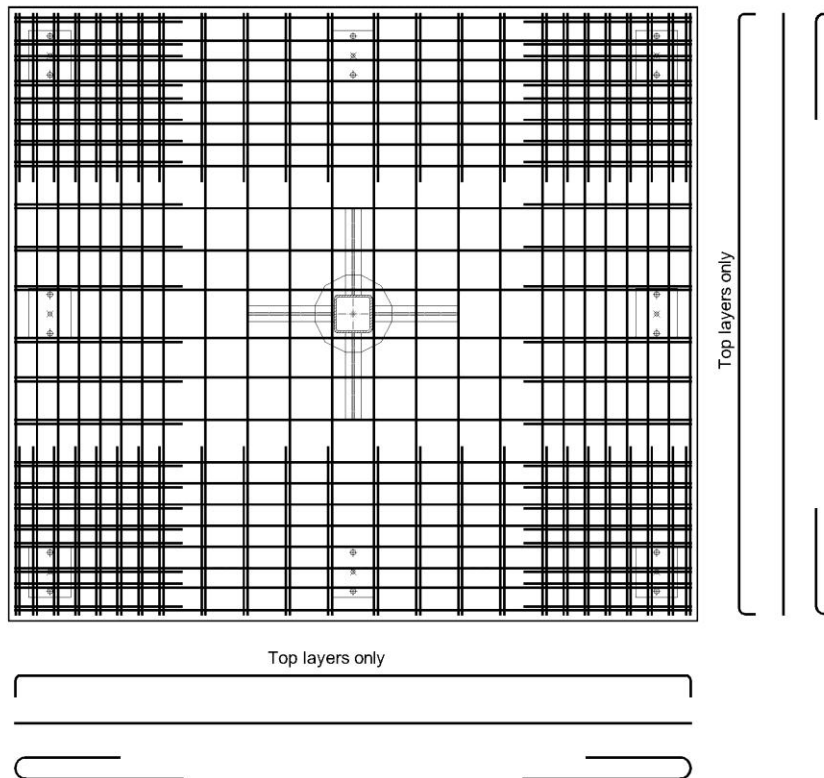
Reinforcement details for Slab H1 (cover 20mm to top and bottom reinforcement)
